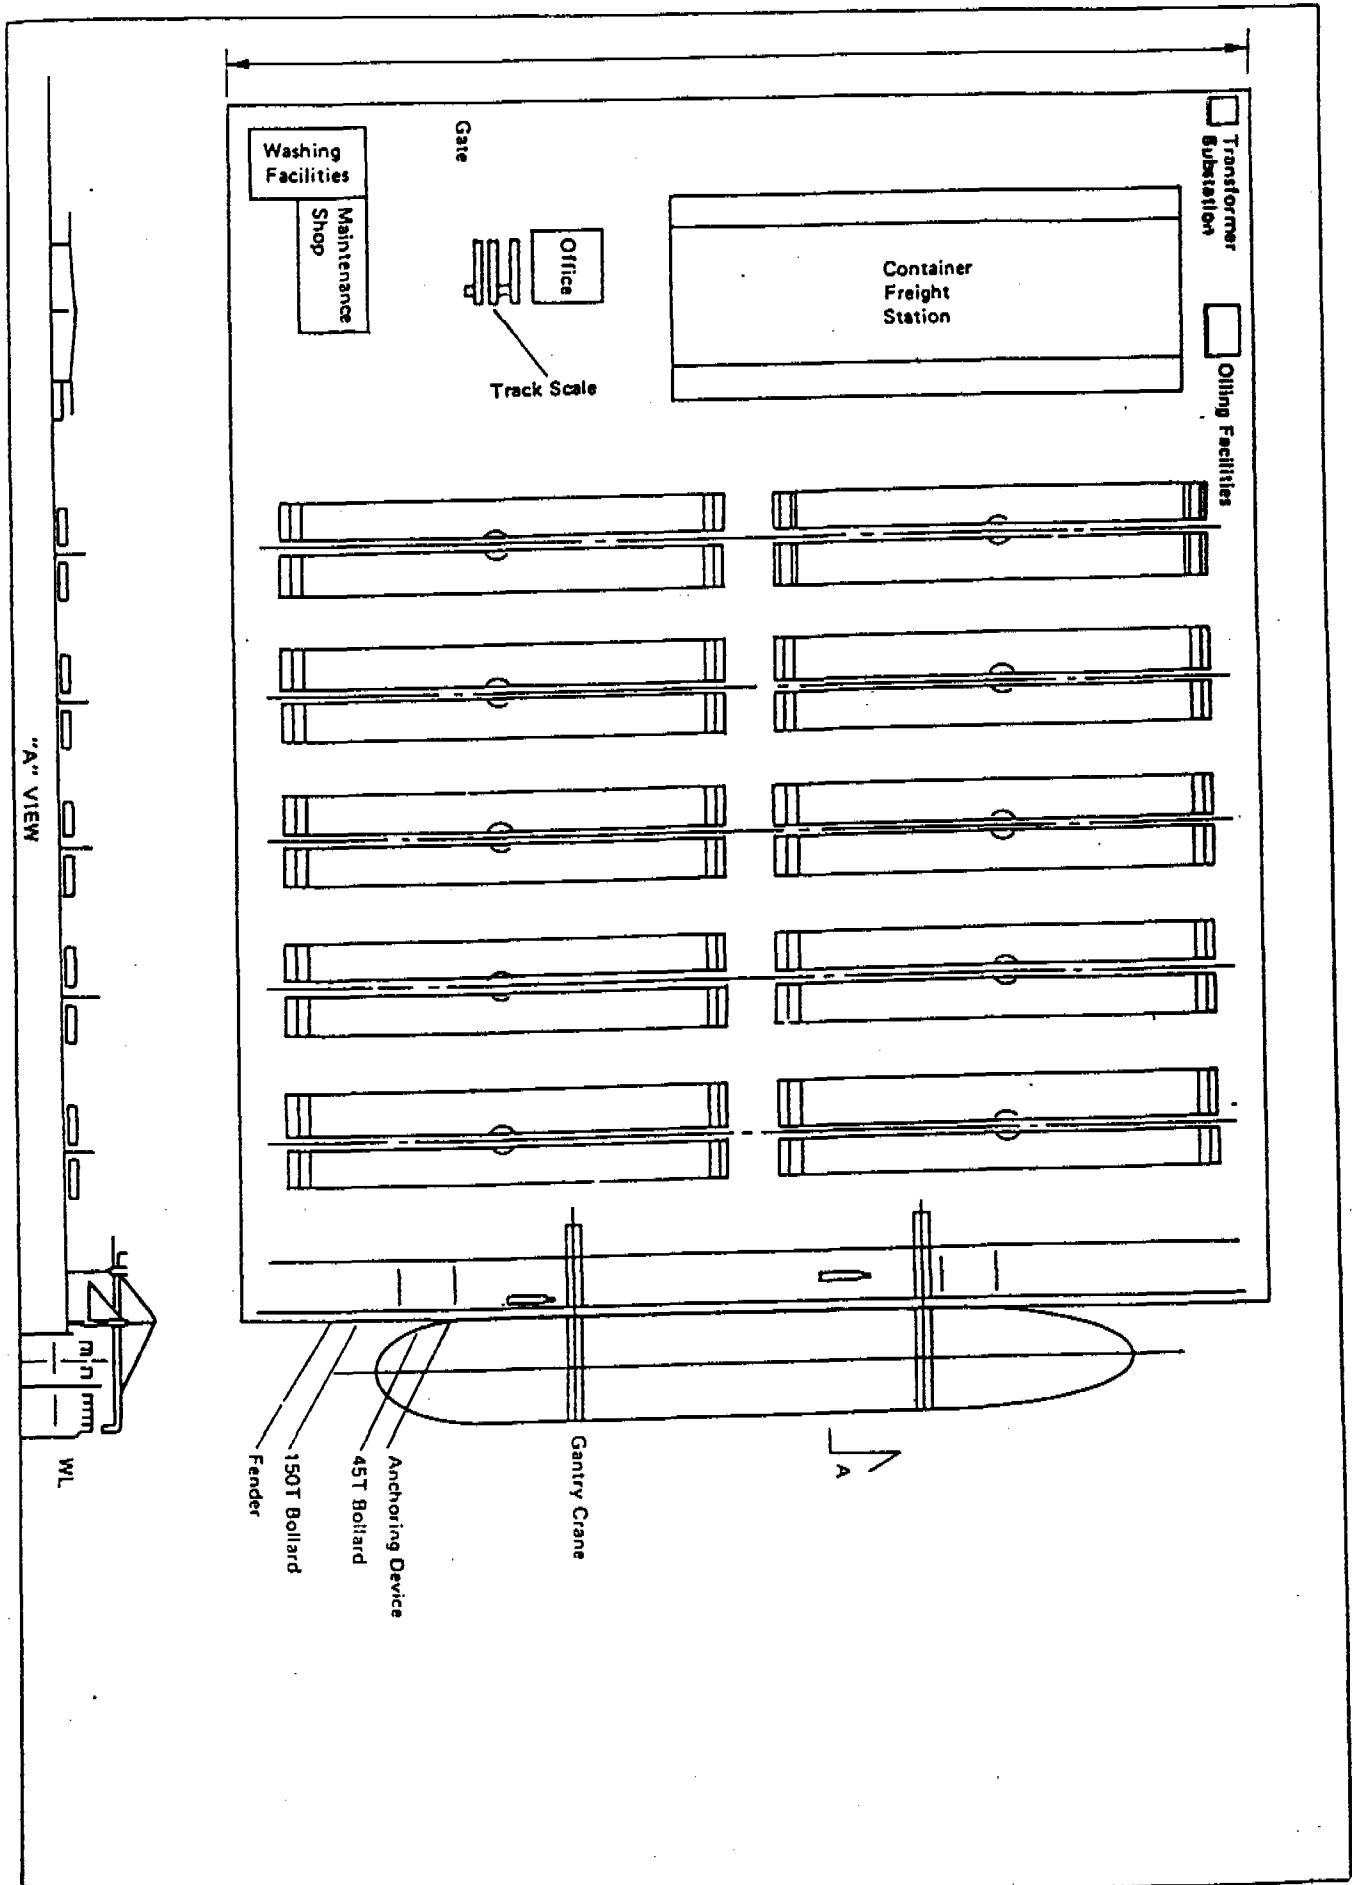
Container Terminal Layout (Straddle Carrier System)
